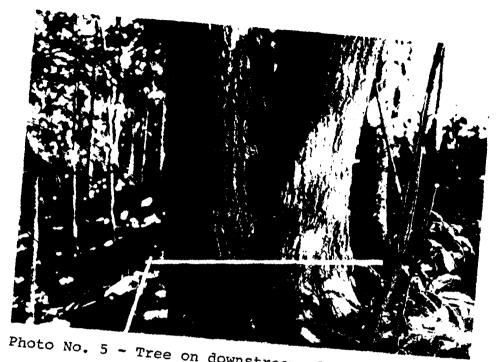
~ Tree on downstream slope 12 feet from crest of dam. Horizontal rule equals
